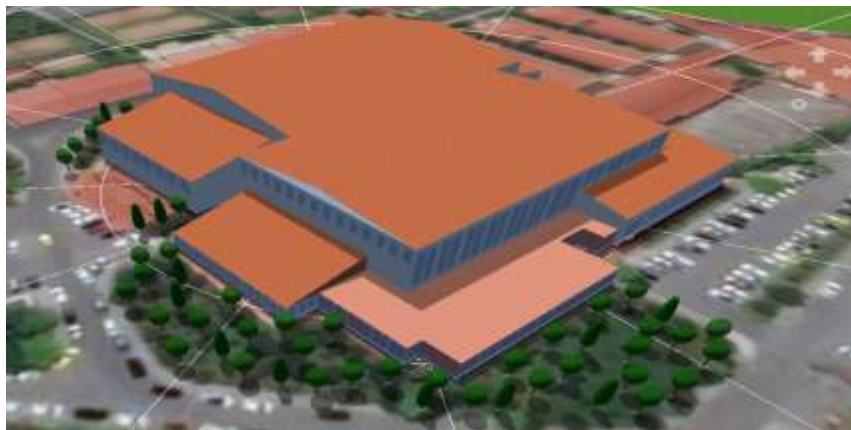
Typical 3D Illustration of Sport Center Building and Pool Building
